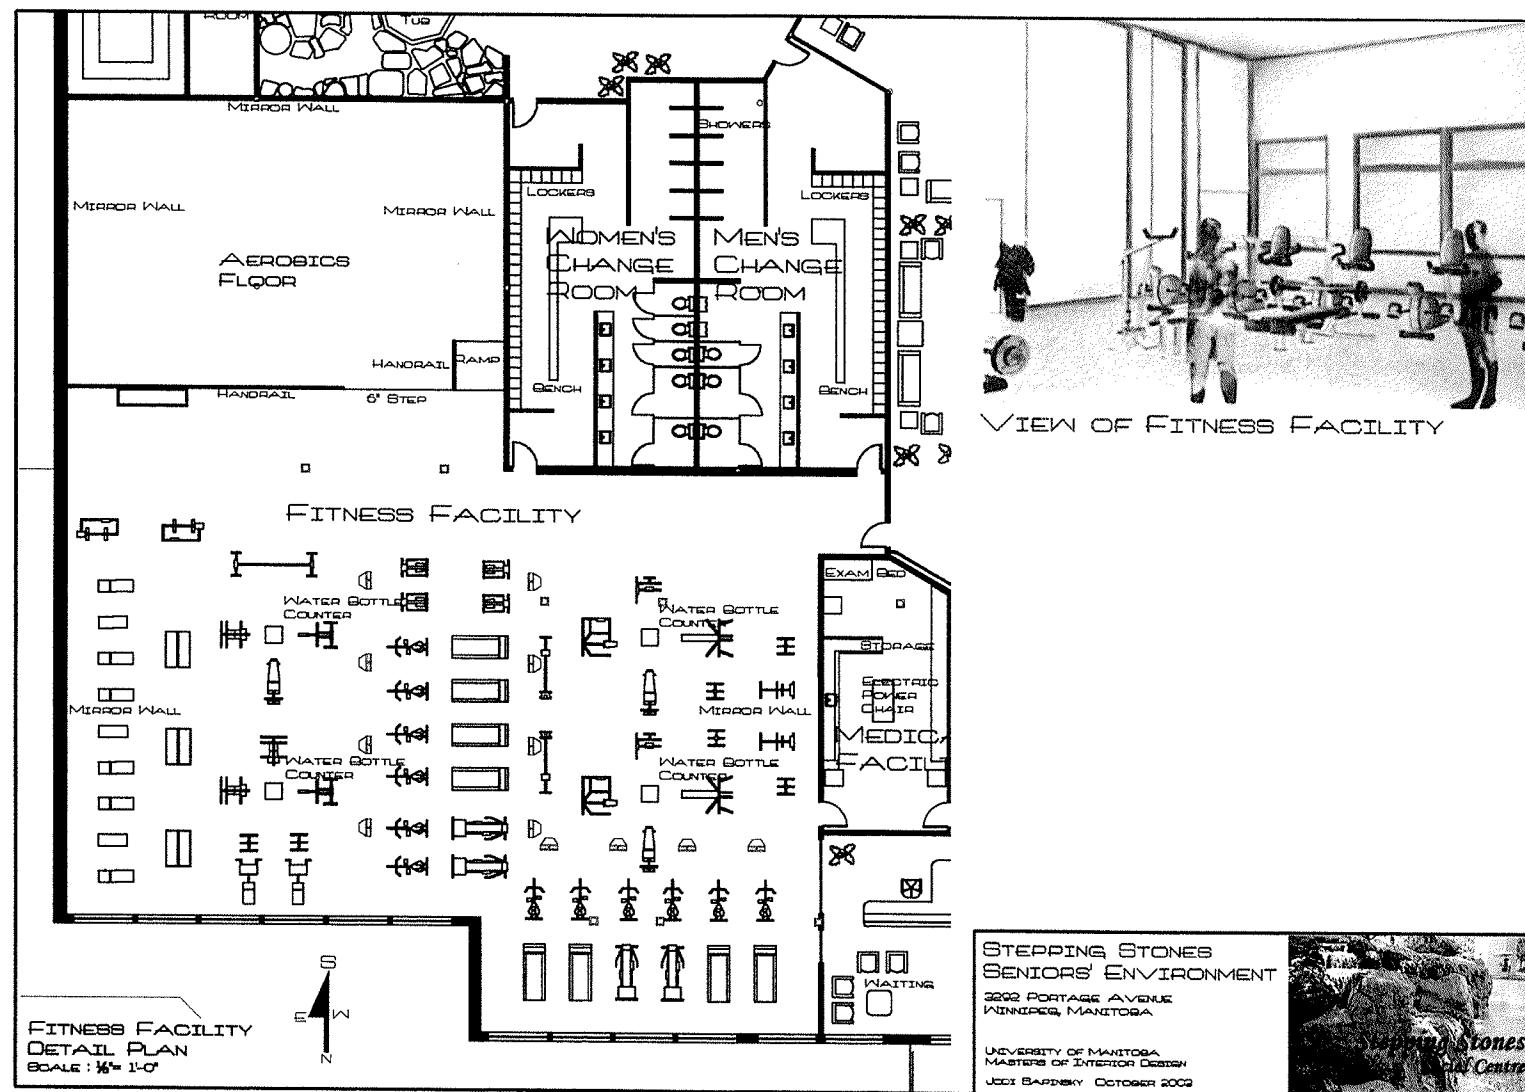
Fitness Facility Detail Plan *Jodi Sapinsky
